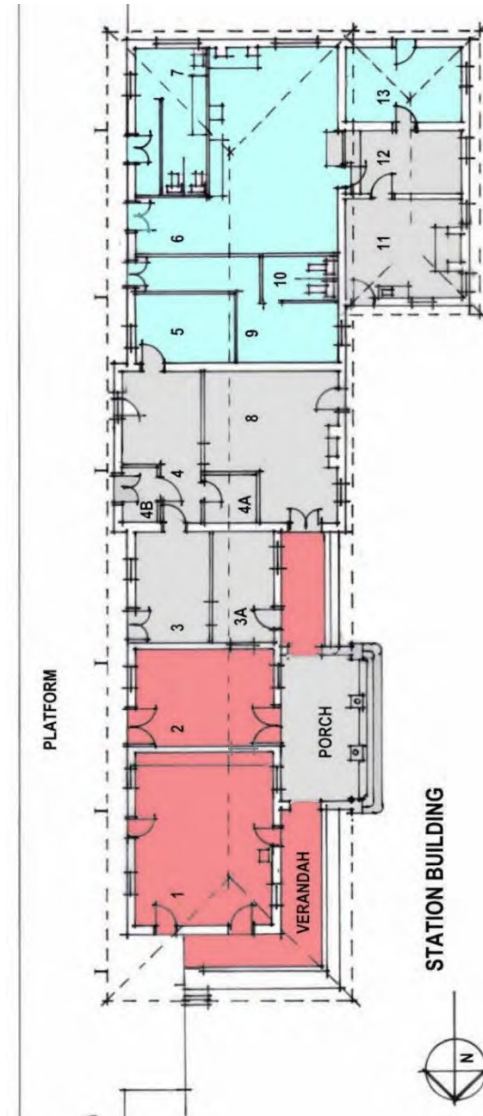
2018 floor plan of passenger station. Source: pdArchitect, base drawing by Ruth Woods Architect.
